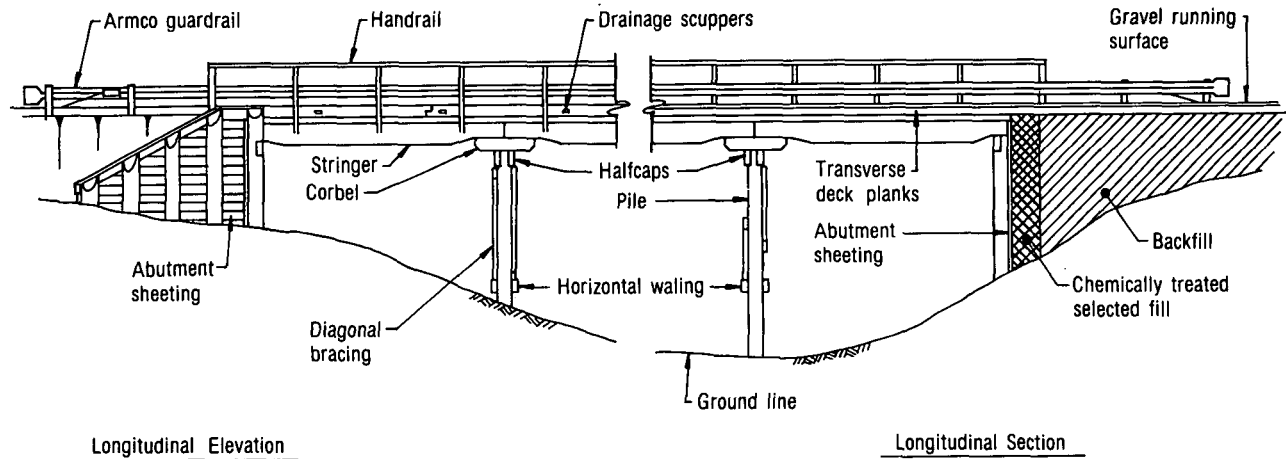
LONGITUDINAL ELEVATION AND SECTION OF STANDARD TIMBER BRIDGE
